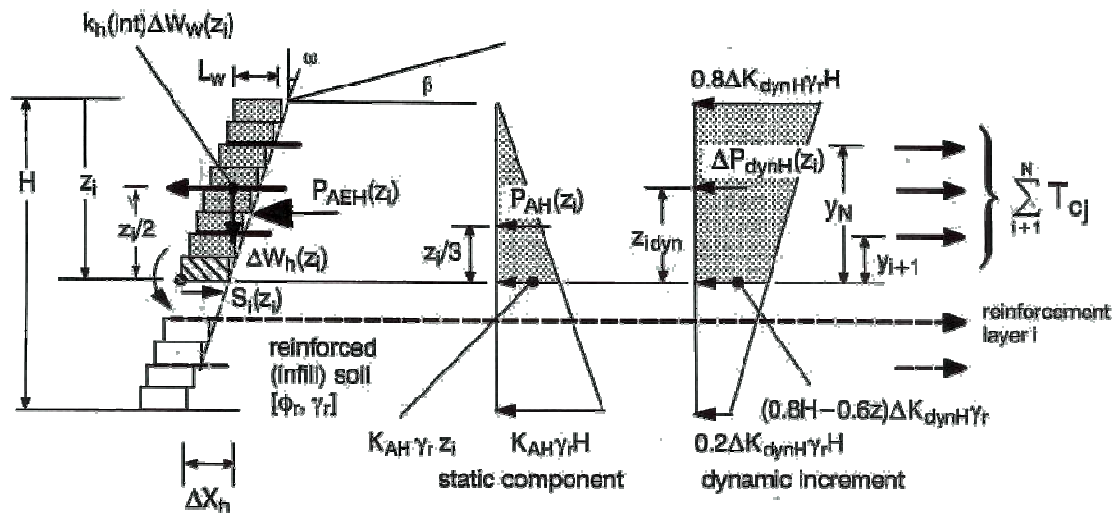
Geometry and forces used to calculate interface shear (bulging) and overturning of the facing column for reinforced SRW structures
